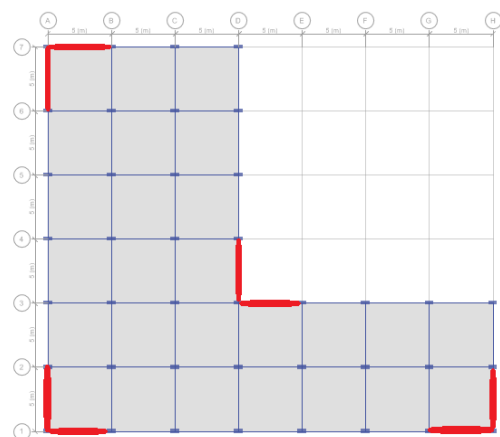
Plan of Model 4 (locations of bracings marked with red line)
